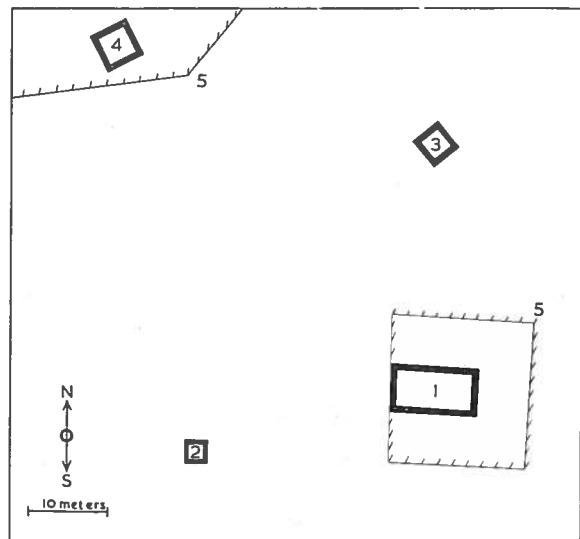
Plan of observatory site with surroundings. Numbers refer to: (1) variometer house, (2) absolute house, (3) unoccupied cottage, (4) owner's new dwellinghouse, (5) fence.
